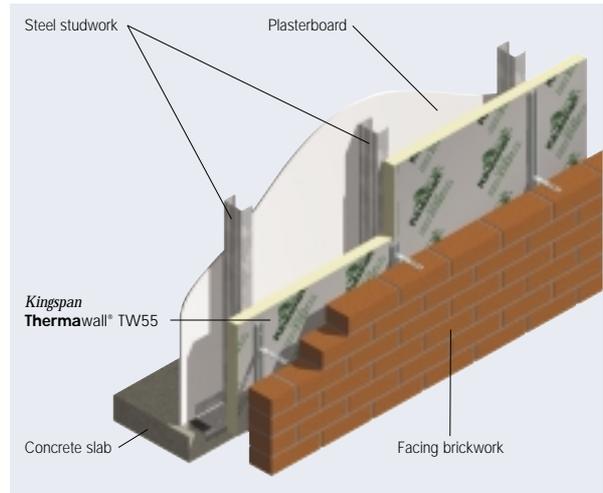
External Masonry – Steel Frame Wall with Insulating Sheathing
